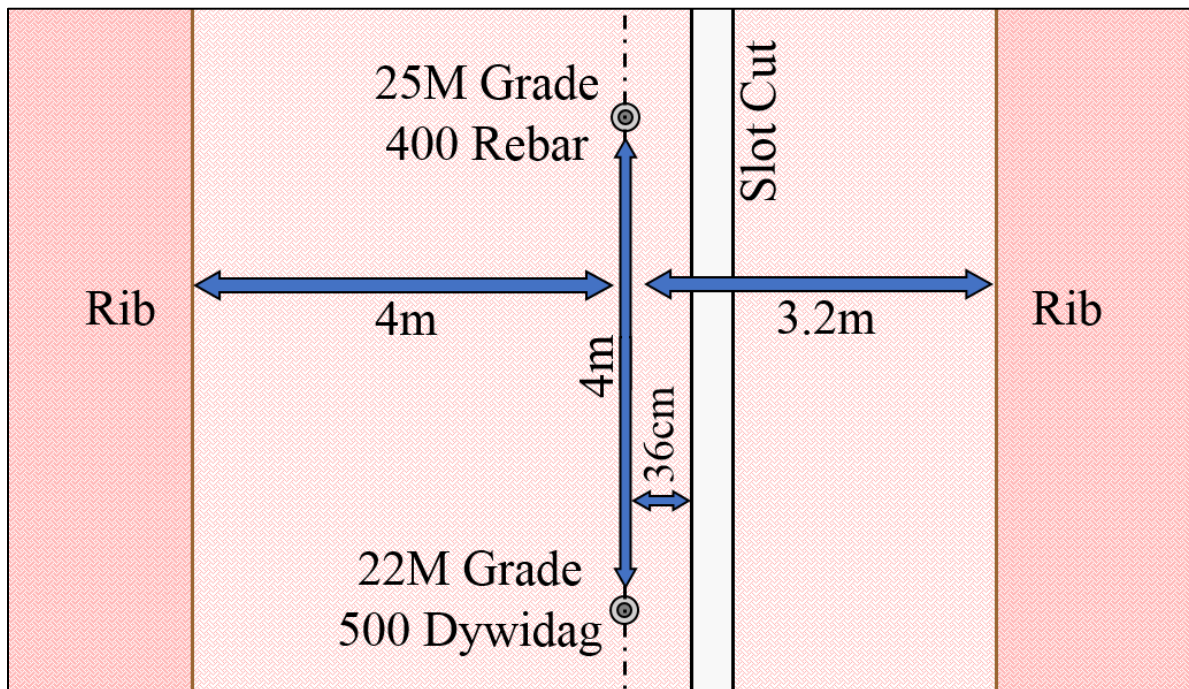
Plan view of the installation of instrumented rebar at Mosaic Colonsay
